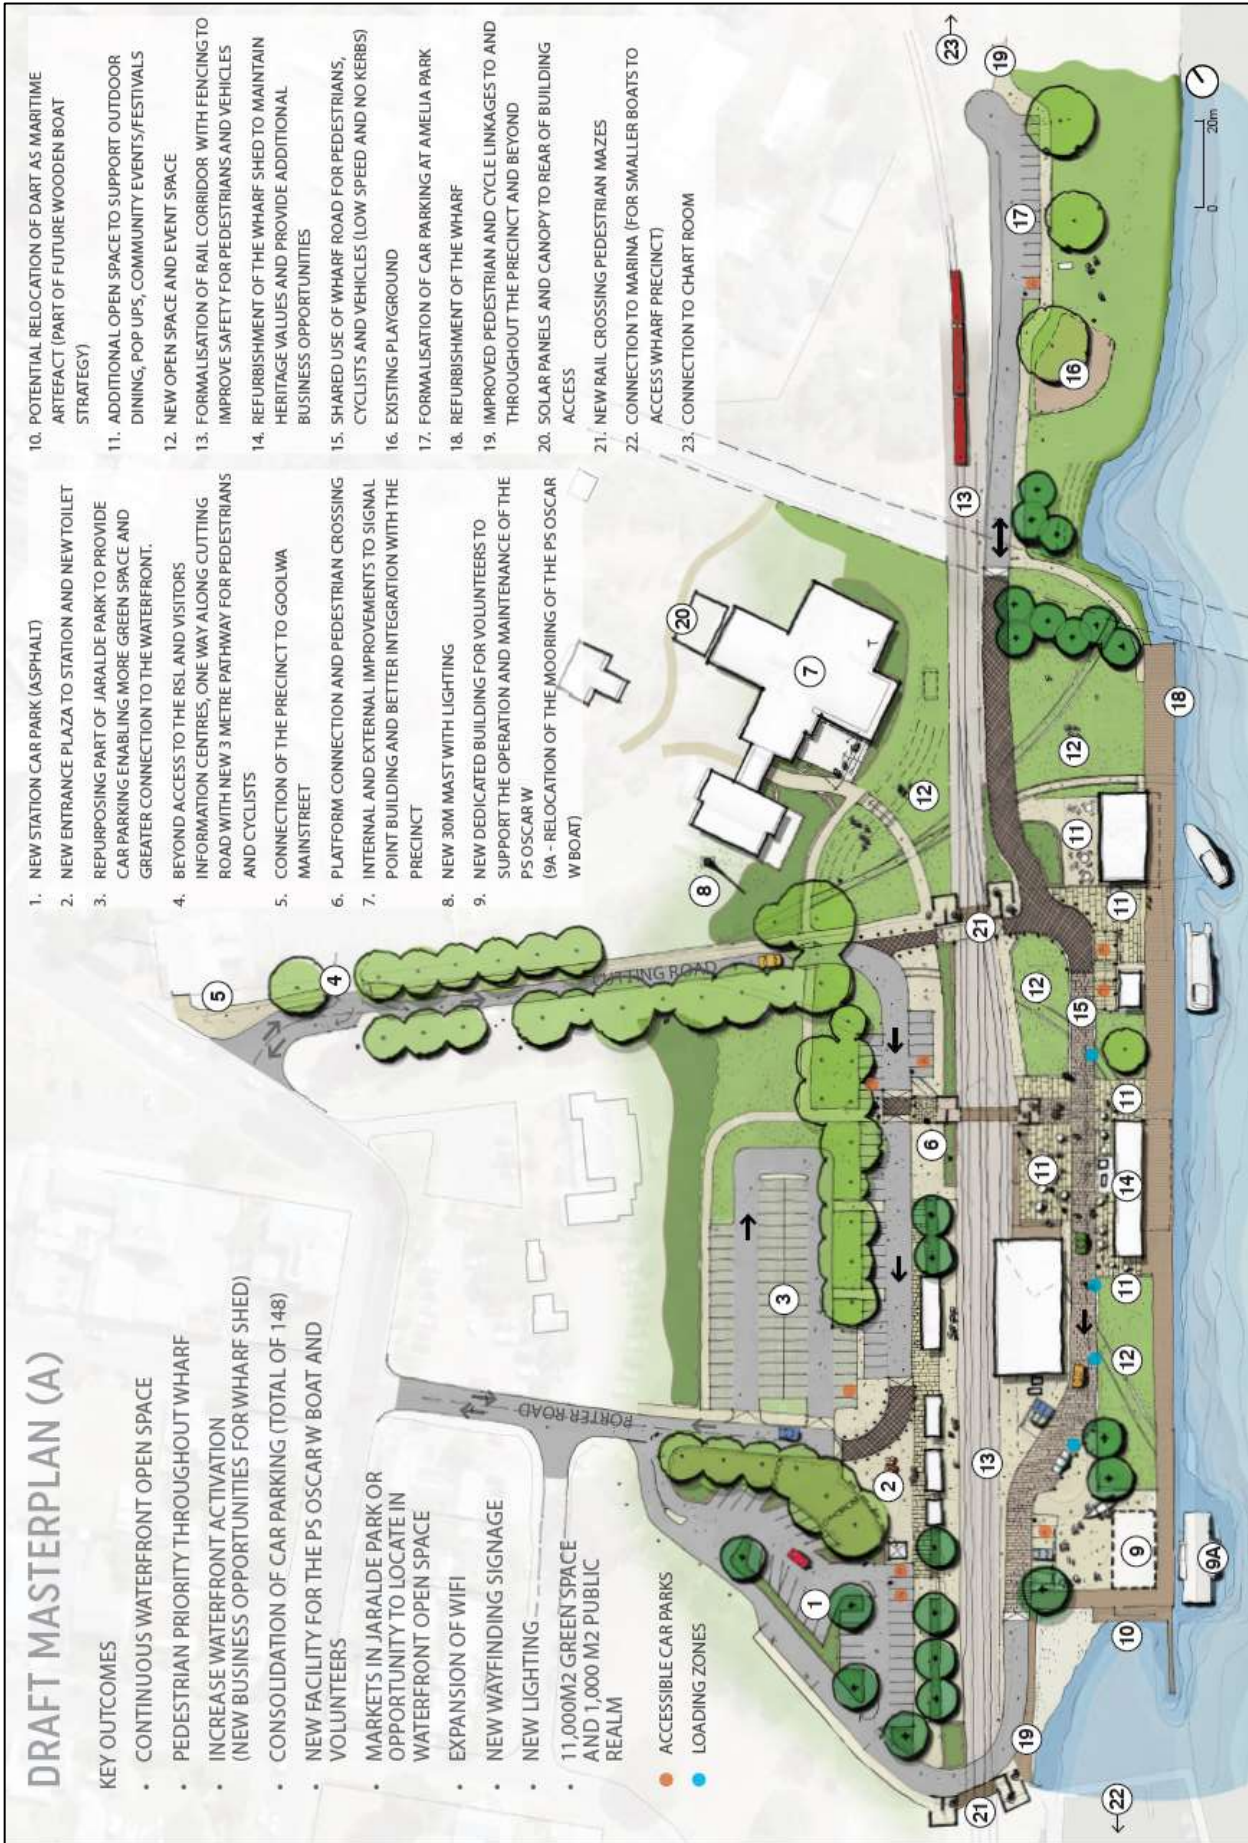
Draft Concept Master Plan A – Wharf Shed Floor Layout
